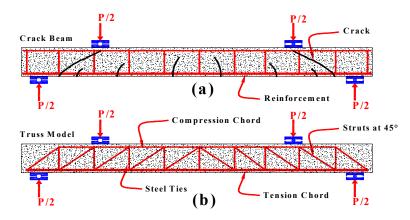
Truss model of beam with web reinforcement: (a) beam with diagonal crack, and (b) simple truss model
